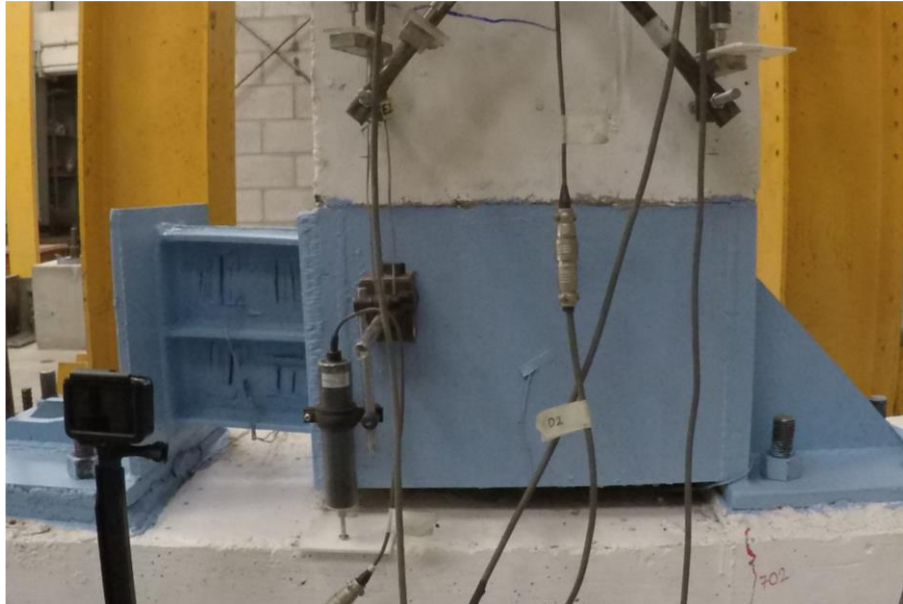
Damper deformation before failure of the beam (specimen P-ID-1M).
